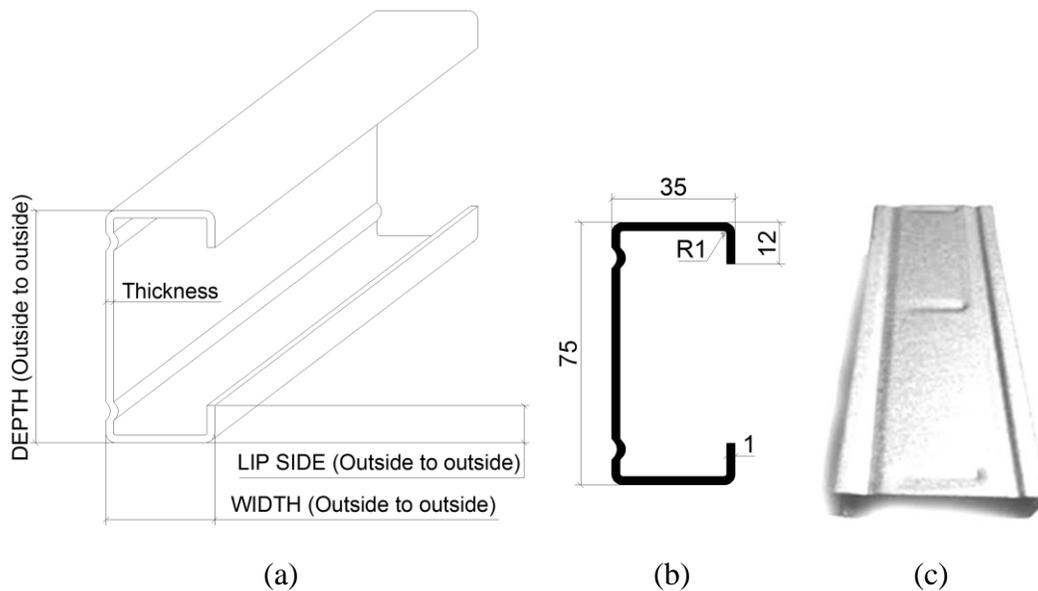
Section geometry and dimension of CFS-CF section (unit; mm);
